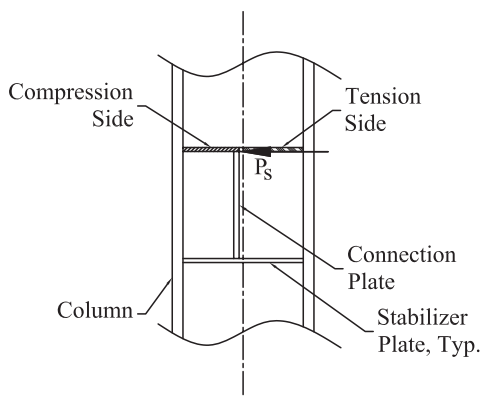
Brace force, P_s , provided by stabilizer plate.
